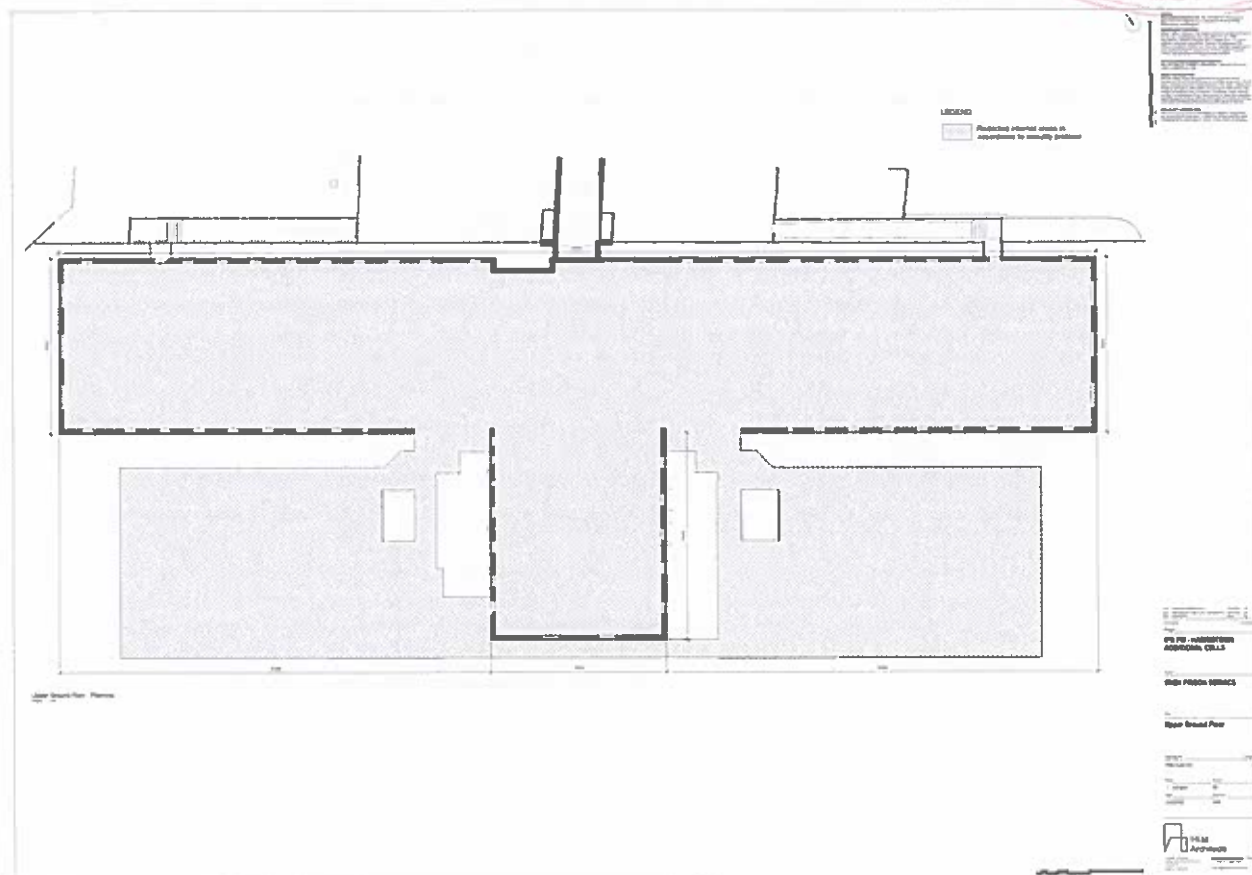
Harristown Block existing floor plan (Source: HLM Architects)
